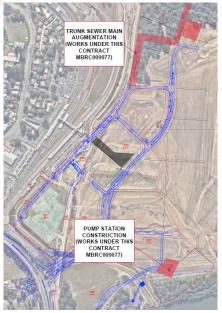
Locality Plan - trunk sewer augmentation and pump station construction
